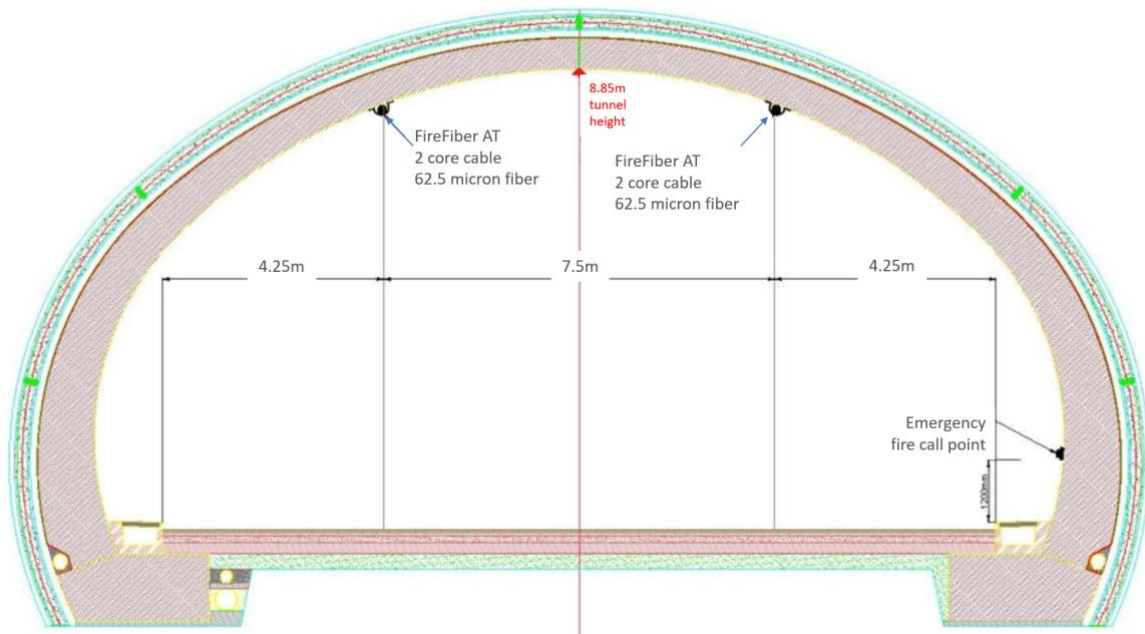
Tunnel cross section and location of FireFiber AT cable
